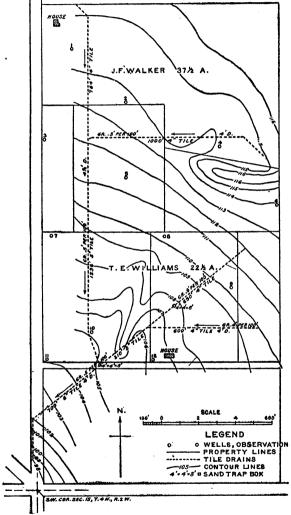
Plan of draining Walker and Williams fields, Syracuse, Utah.
